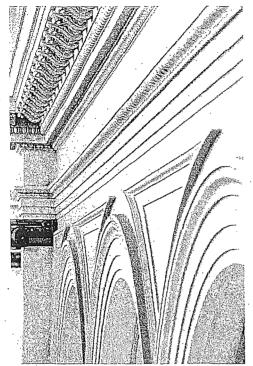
Detail, plaster arches. (Rich Stapleton, 05/21/2018)
